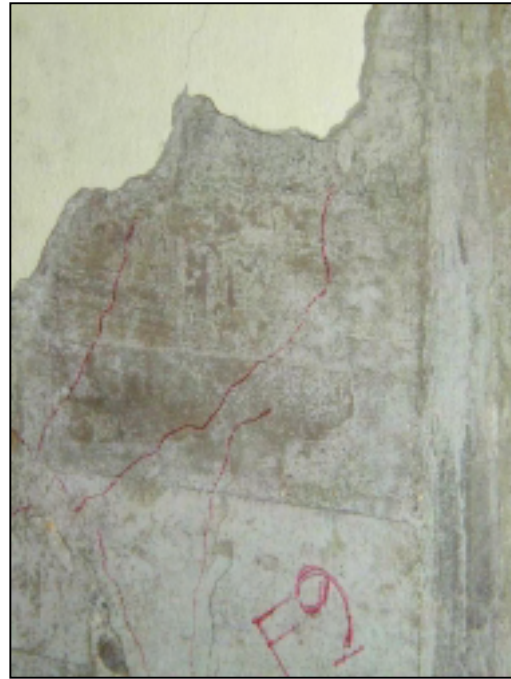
Diagonal crack in column F9 at the ground story
